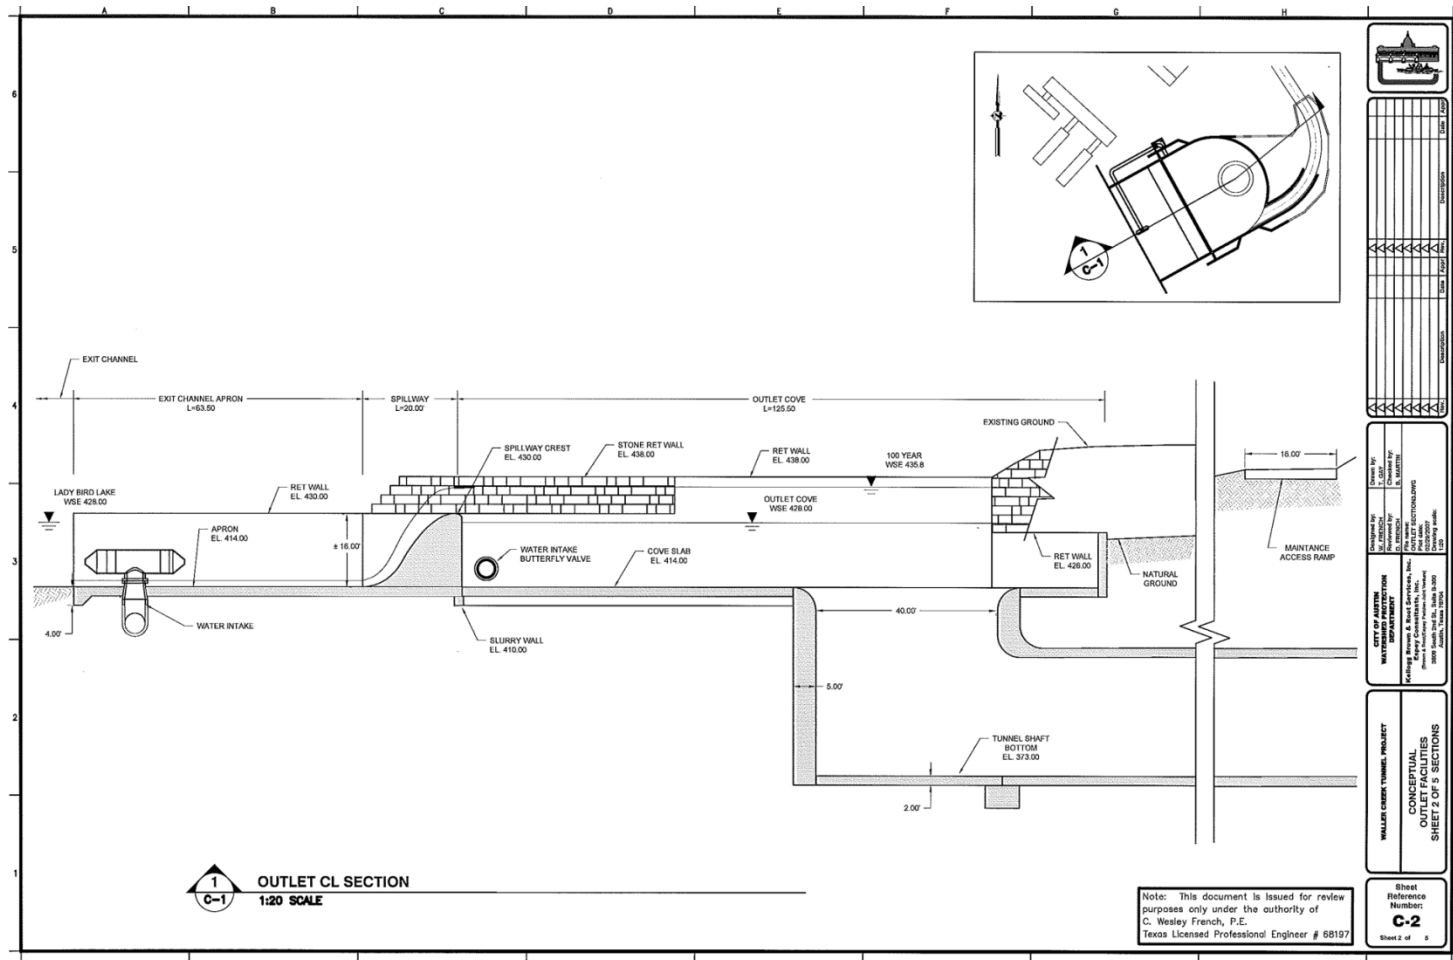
Waller Creek Tunnel Project; Outlet-Section
